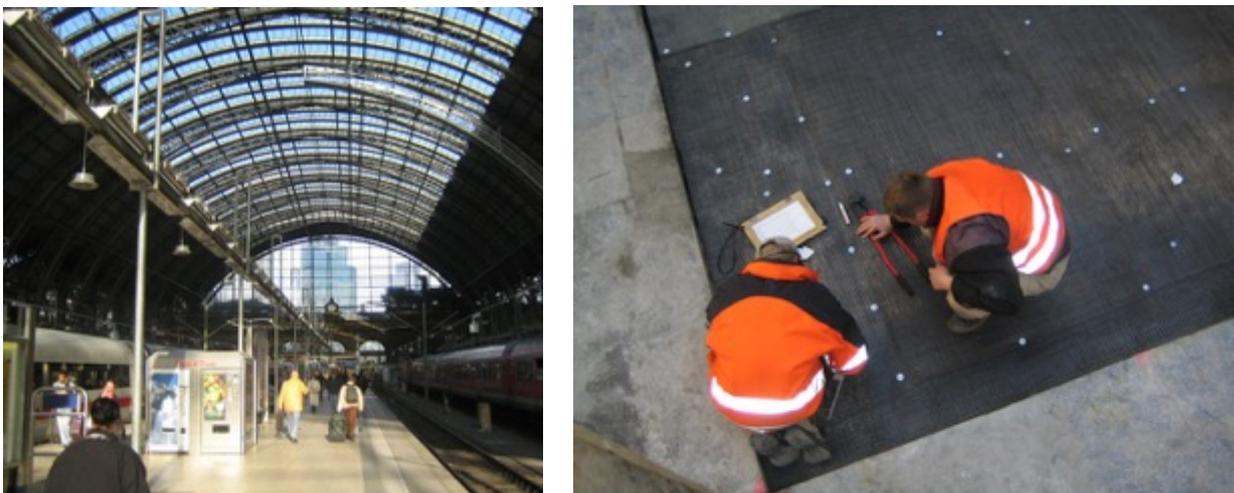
Slab strengthening at Frankfurt Main Station (left); Manufacturing of MicroMat® (right)
